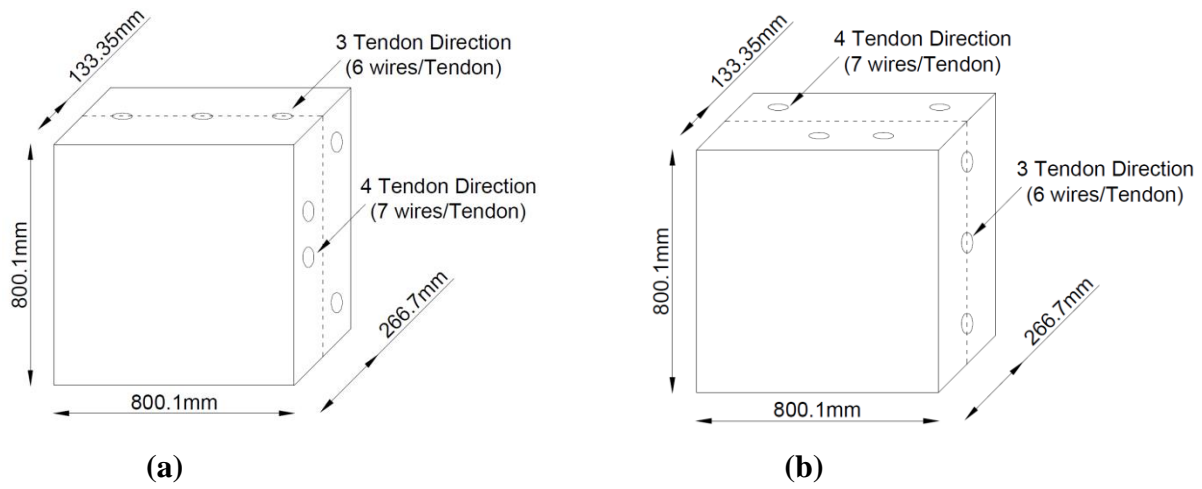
Sketch of the wall specimen with the prestressed reinforcement: (a) tendon orientation in the containment structure; (b) tendon orientation in the wall segment specimen.
